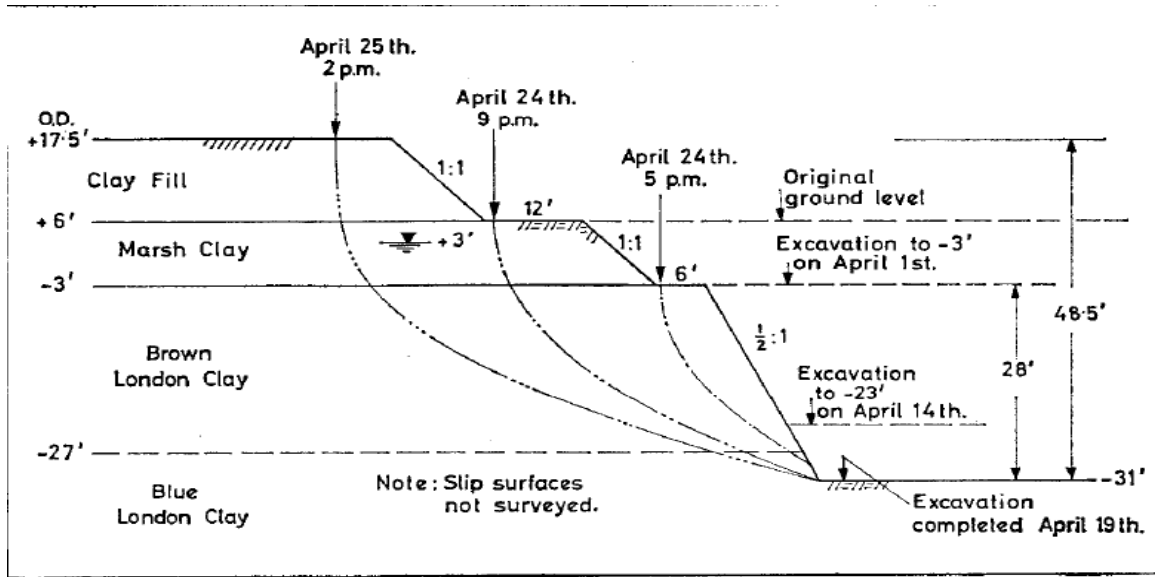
Cross Section of Excavated Slope at Bradwell (Skempton and LaRochelle 1965)
